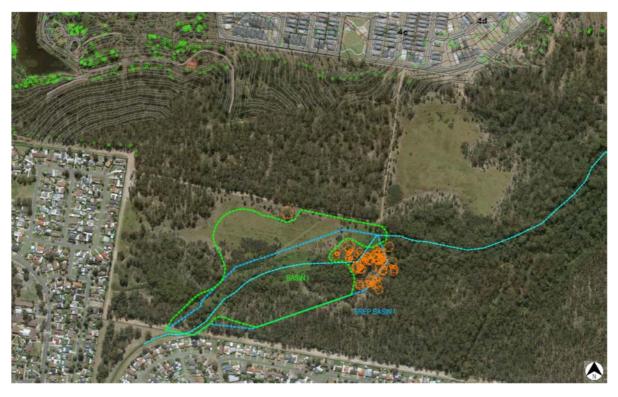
Detailed view of the existing (blue) and proposed (green) Drainage Basin I.
